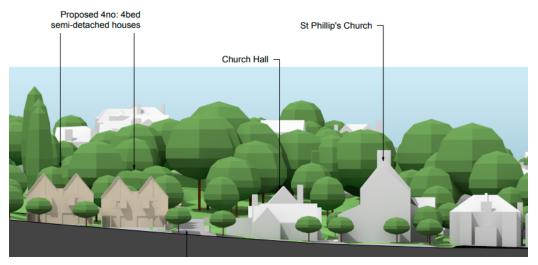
Current Proposal – 4 Houses Facing Beech Road
